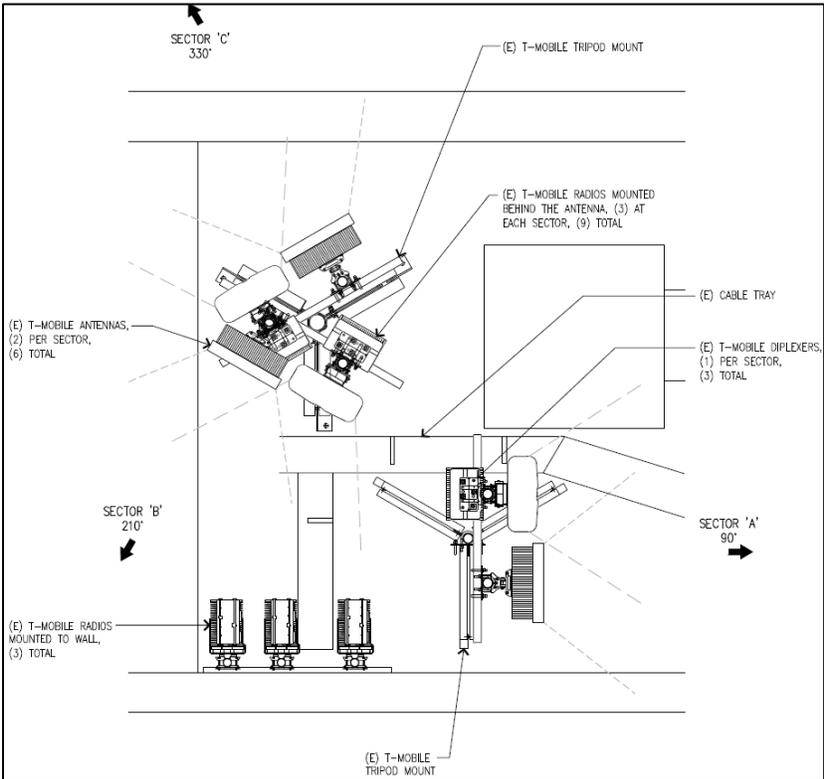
Antenna layout plan (Source: Plans, Page A-2, panel 2).
